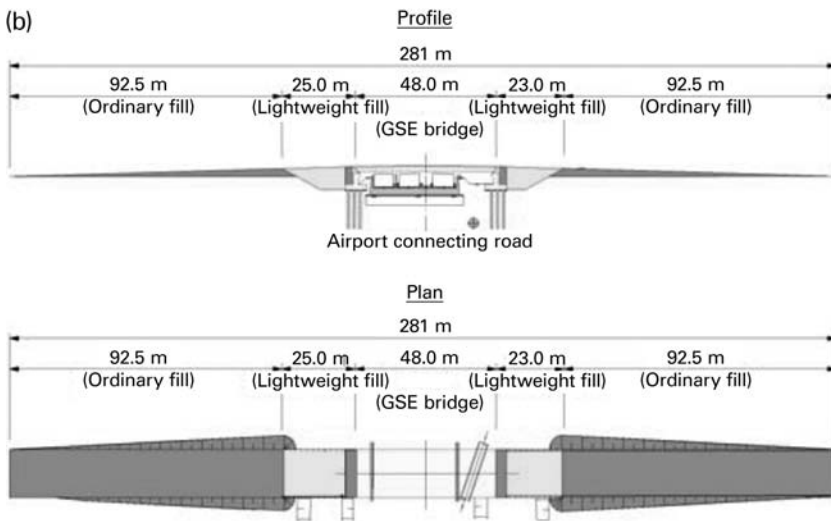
Overall view, elevation and plan of GSE Bridge [JSCE award home page], [148]
